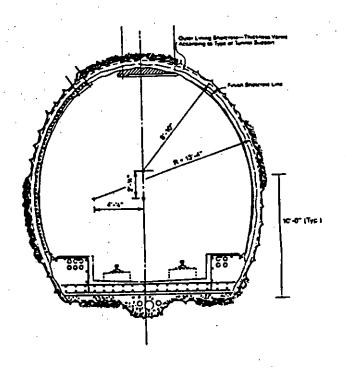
Tunnel Section constructed by New Austrian Tunneling Method.
